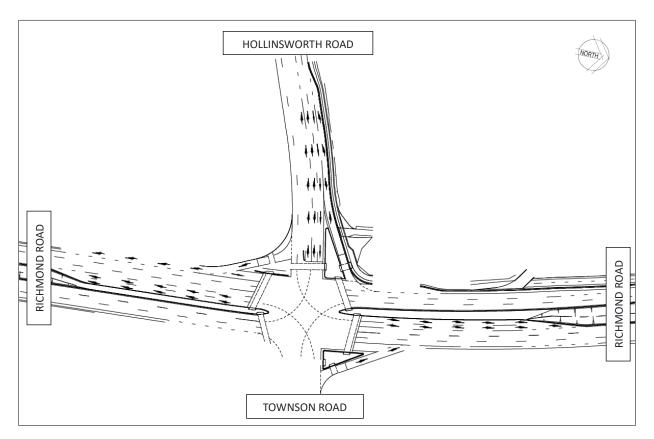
Plan view of the proposed Richmond Road / Townson Road / Hollinsworth Road intersection
